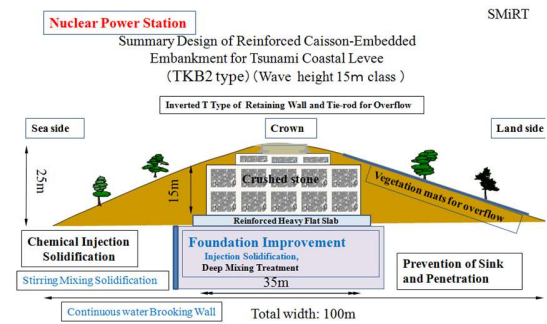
No-collapse stable cross section of proposed embankment with foundation improvement and impermeable wall to prevent penetration of sea water under the bottom of the embankment. The foundation improvement by stirring and mixing solidation stops the intrusion through the bottom into the areas of NPSs and also to prevent the sink of the levee.
